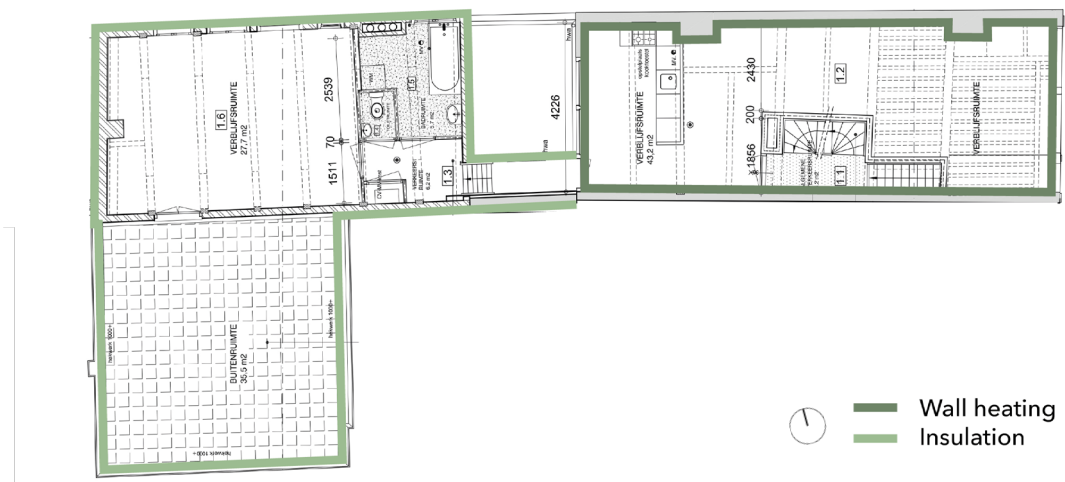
Proposed insulation design. Adapted from Stadsherstel, 2005.
